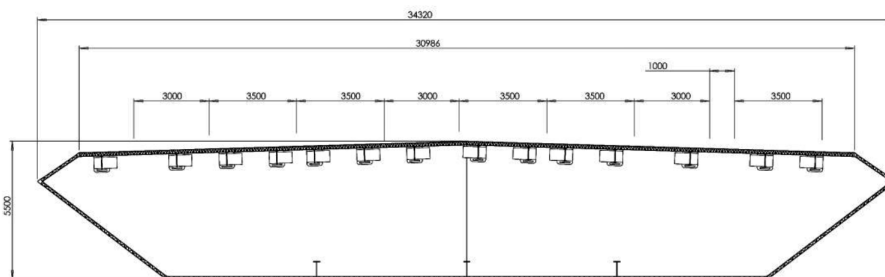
Panel girder cross section, as presented in Olav Olsen’s report
